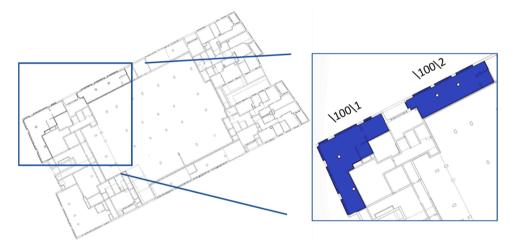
Architectural plan that illustrates Organellen \100\1 and \100\2, at Plan 10. The floor plan is generated from the property formation model in Fig. 12.
